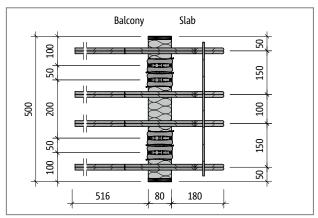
Schöck Isokorb® type Q-E-W-VV5: Product layout
